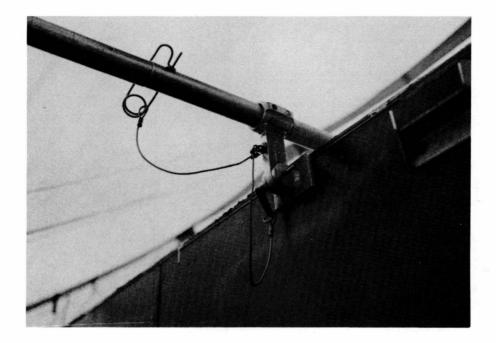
Red and black horizontal struts join to make one piece and are pinned to the wall.
